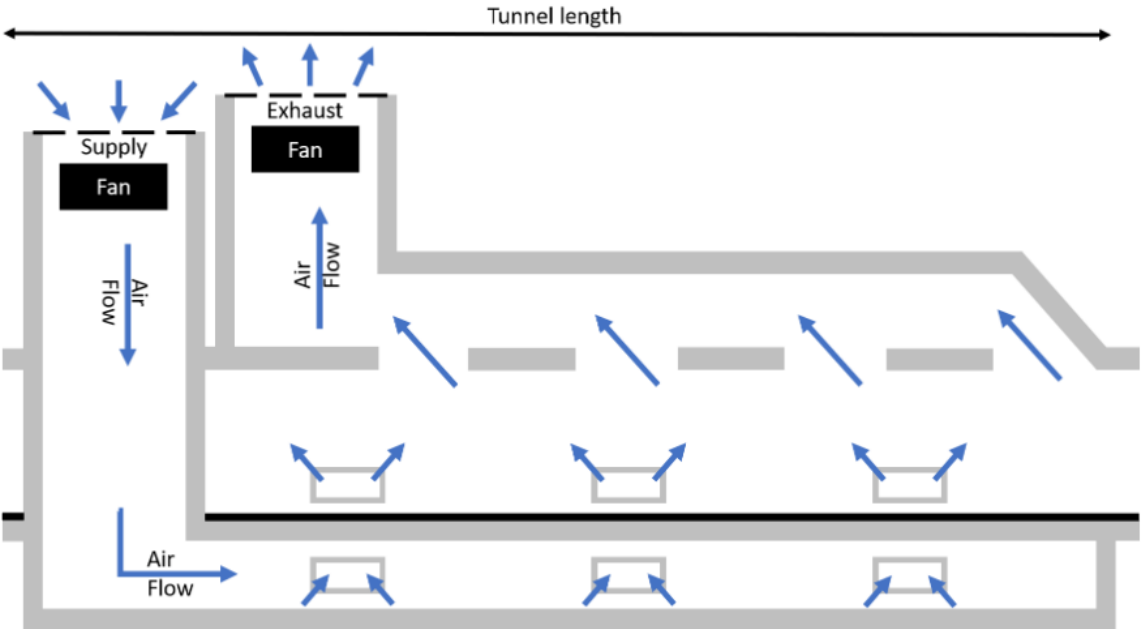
Transverse Ventilation System Used in Tunnels [15]
